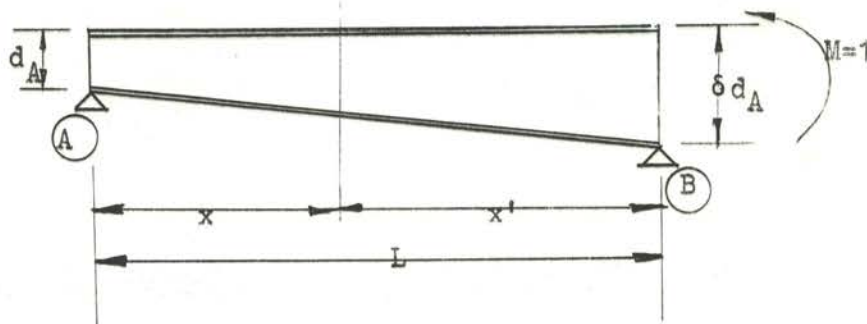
A Tapered Beam of I-Section, Box-Section or T-Section Unit Moment at B.
